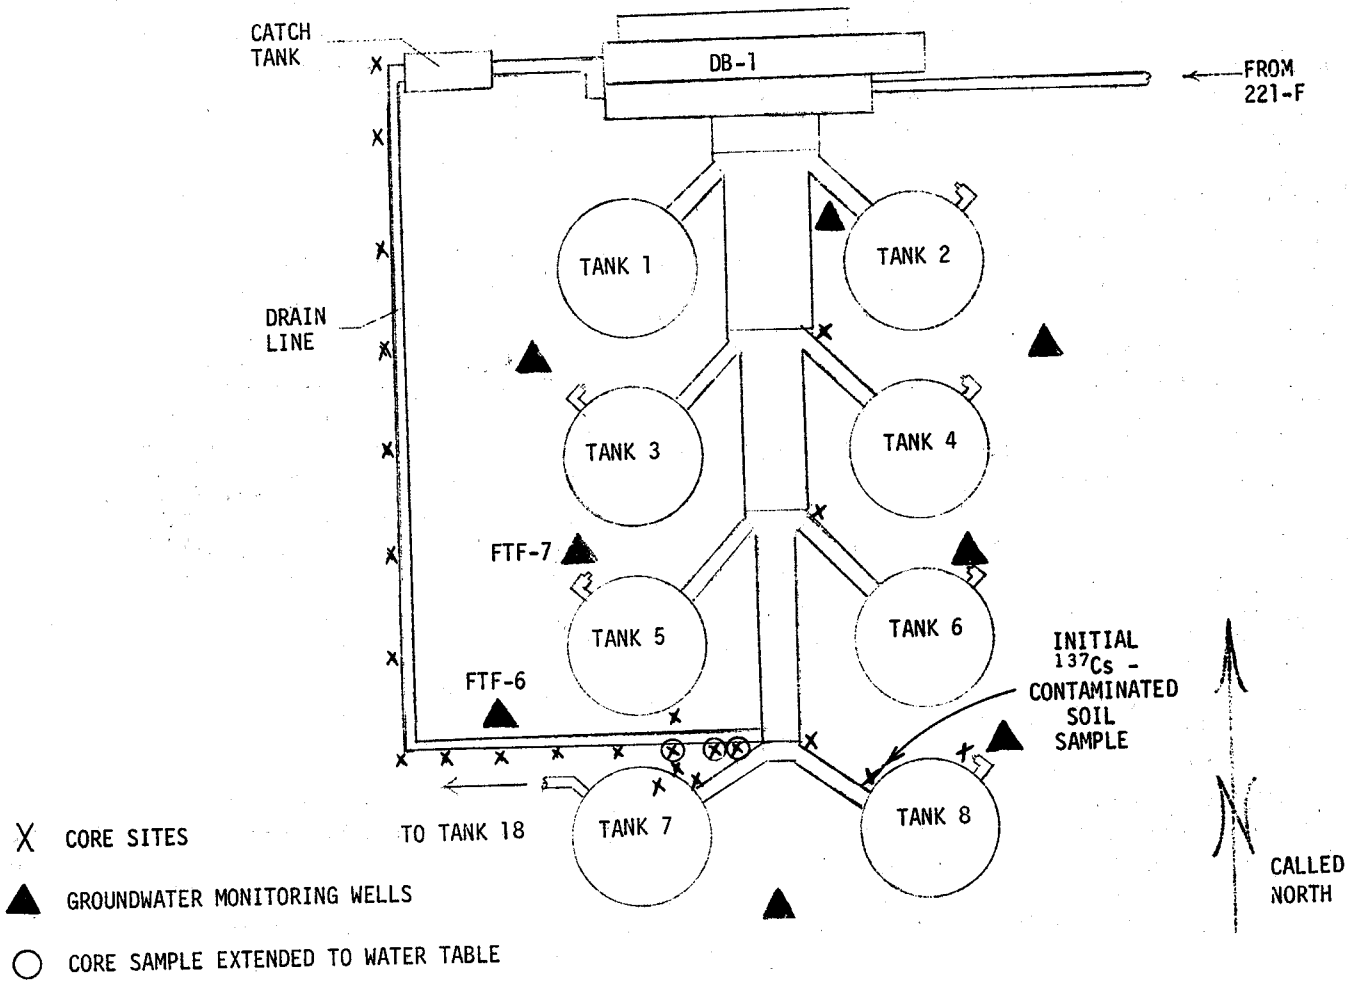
241-F UNDERGROUND ENCASEMENTS
